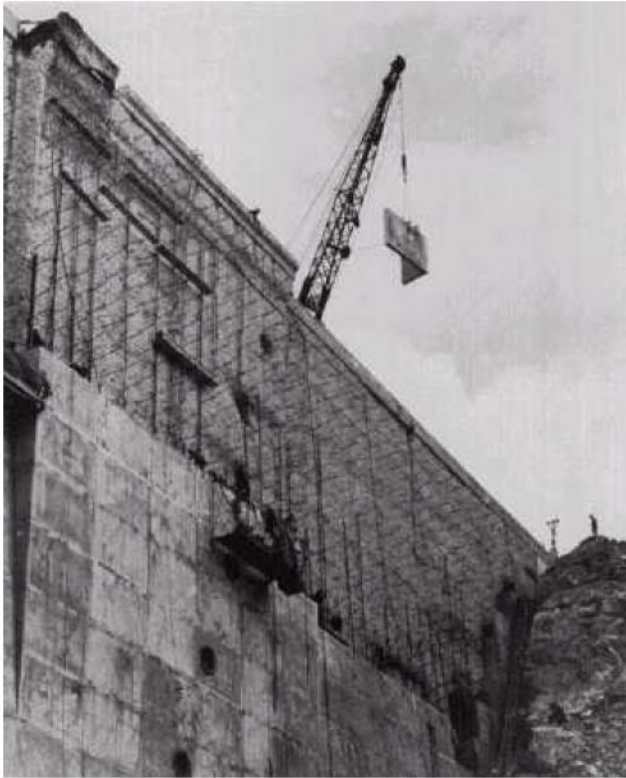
The use of precast concrete slabs as formwork during the refacing of Barker Dam (Nederland, Colorado) by PAC method in 1946
